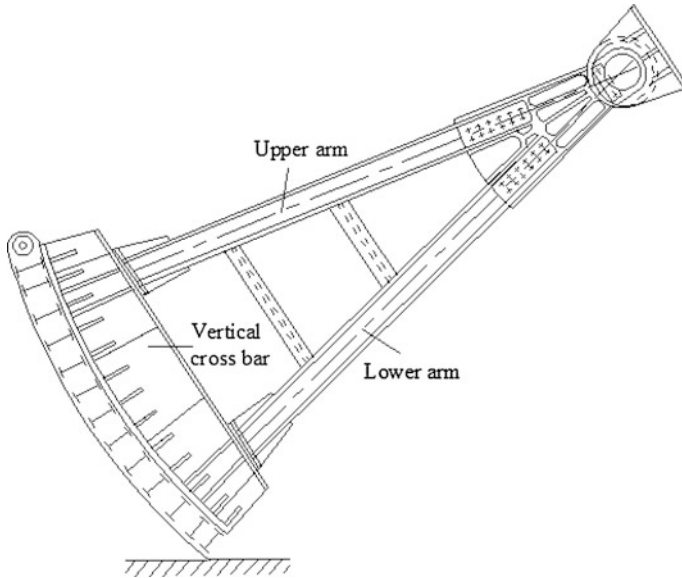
Vertical girder framework—arrangement of arms (elevations)
